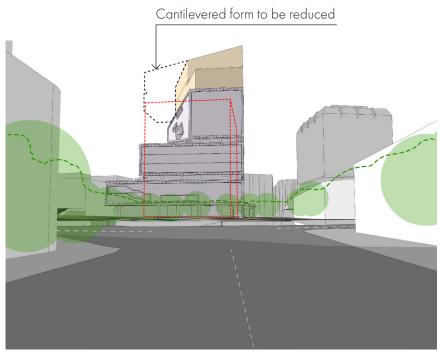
Design Alternative from The Appian Way (Source: Tract 2019)
